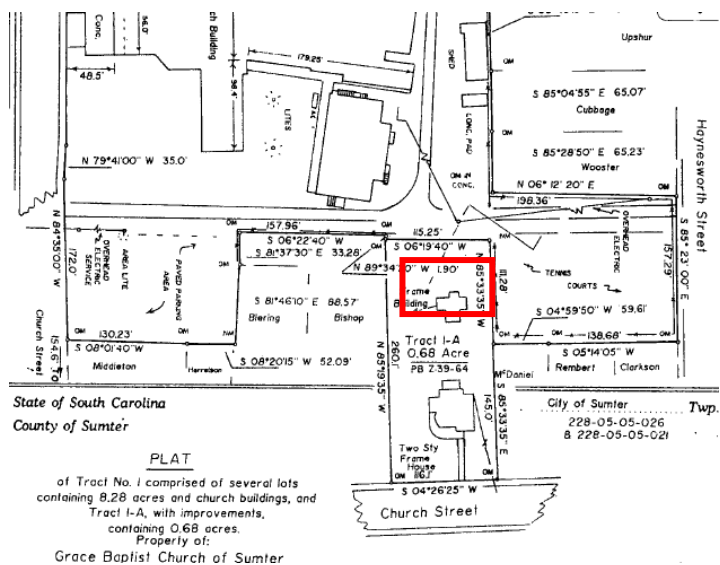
Former Residence at Corner of Church and Haynsworth Streets
